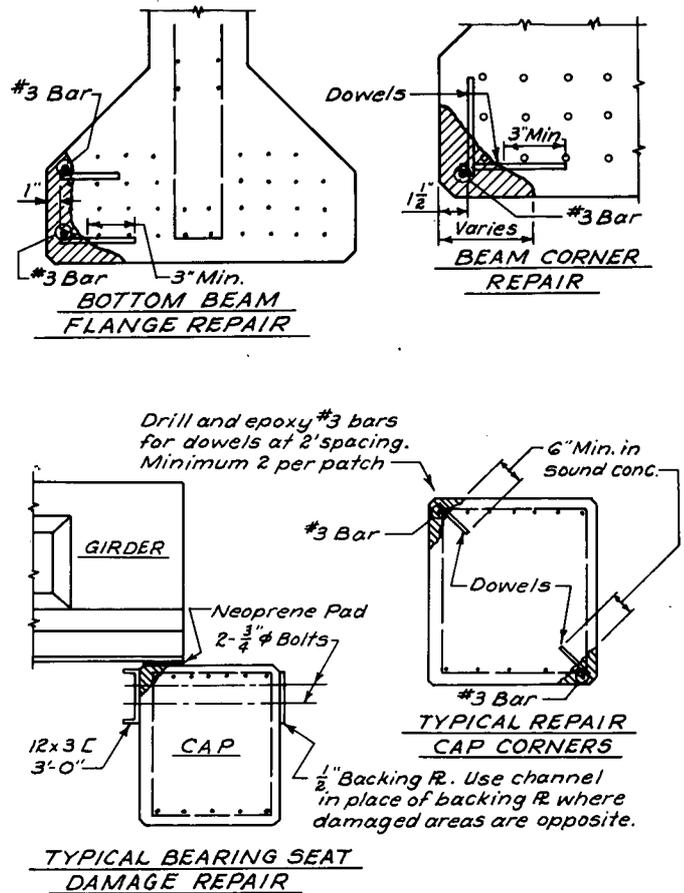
Repair of fire damage. (Courtesy of Texas DOT)
